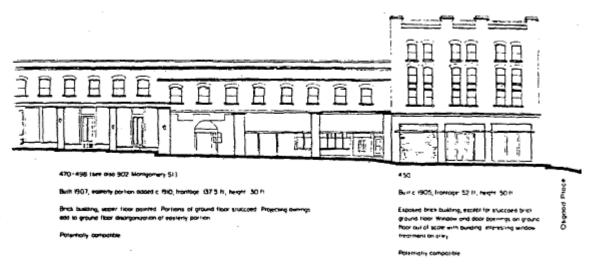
Façade elevations and architectural description diagram for the block of the subject building (subject building at right). Source: Jackson Square Report.
